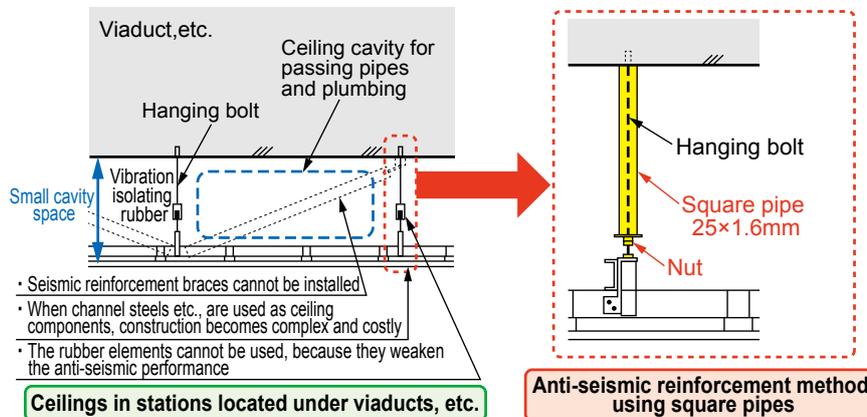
Seismic reinforcement problems in station ceilings, and anti-seismic reinforcement solution using square pipe
